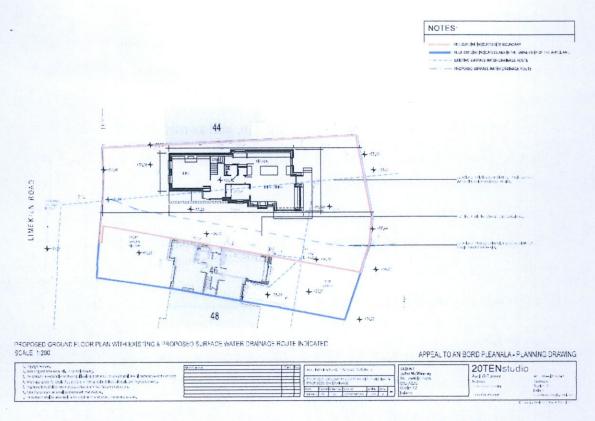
Proposed Site Plan showing existing and proposed drainage alignment
